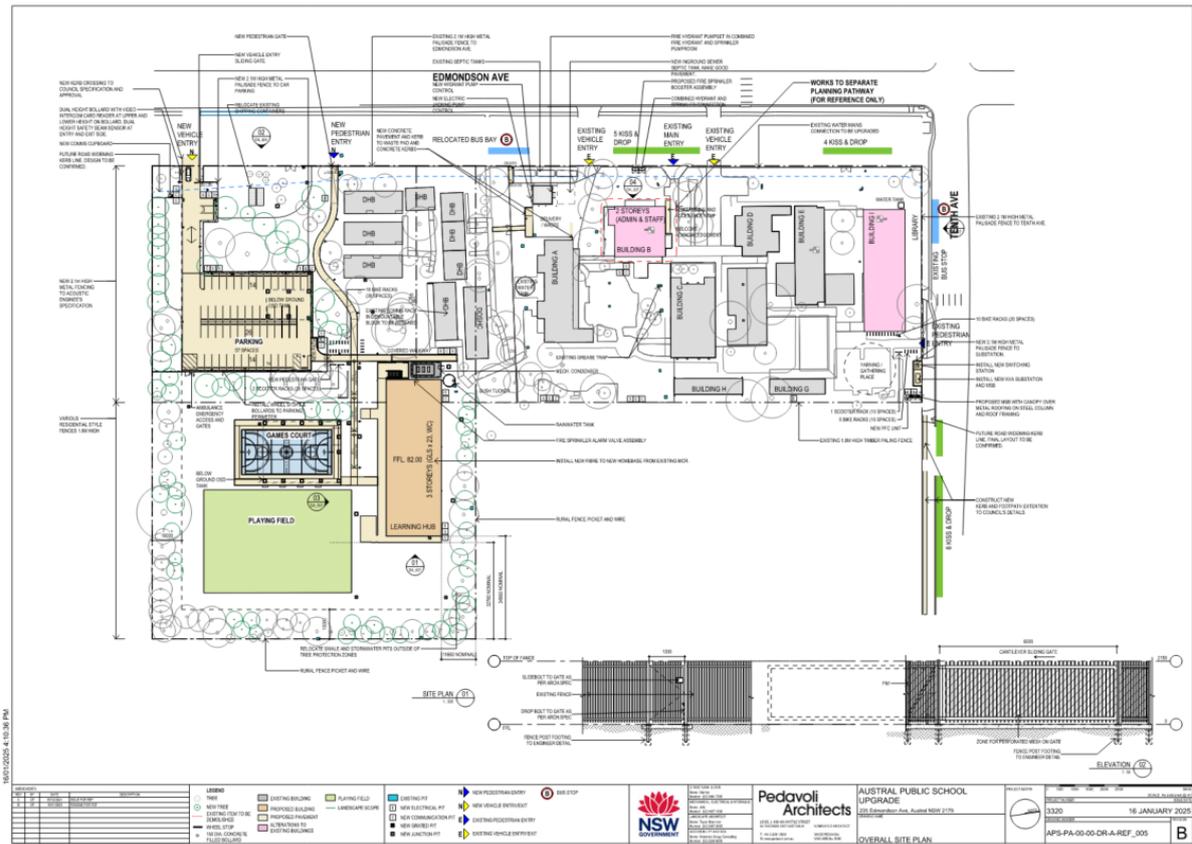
Proposed Activity (Source: Pedavoli Architects, Overall Site Plan (Rev B))
